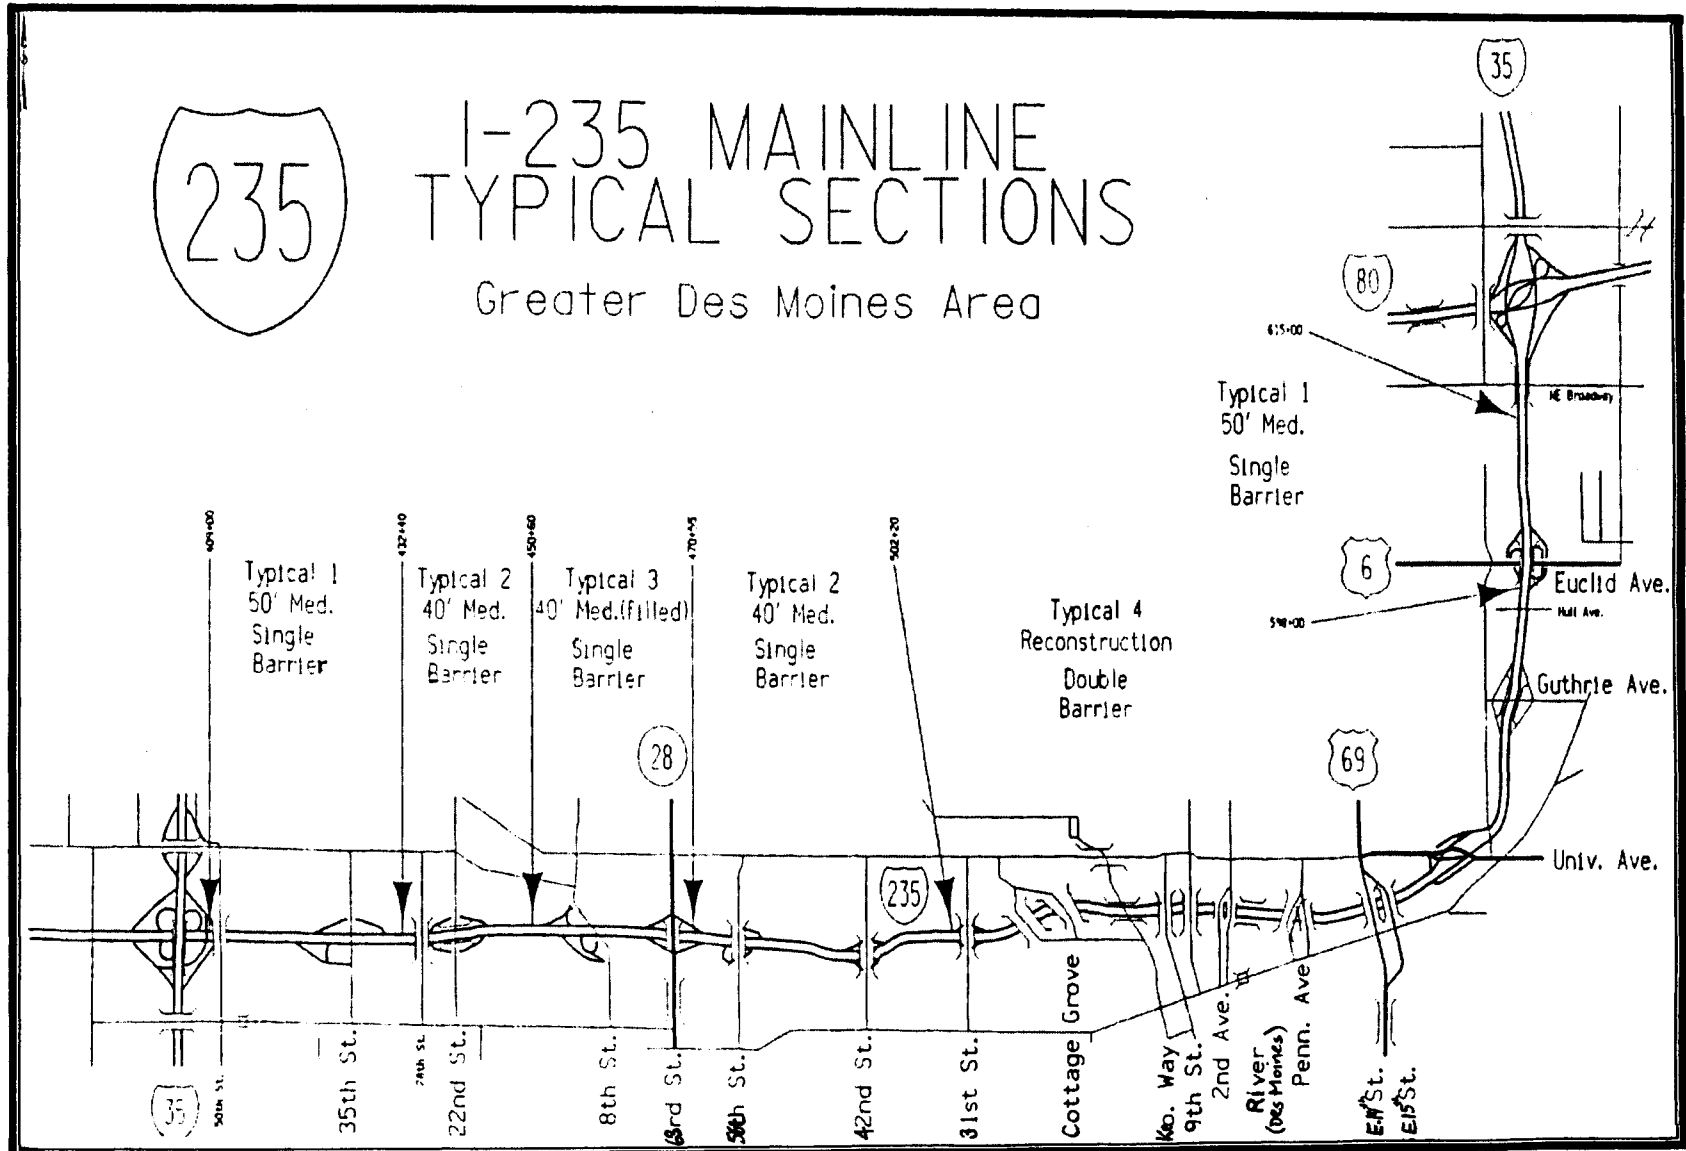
Layout of the location of the four cross-sections typical on I-235 (Iowa DOT)
